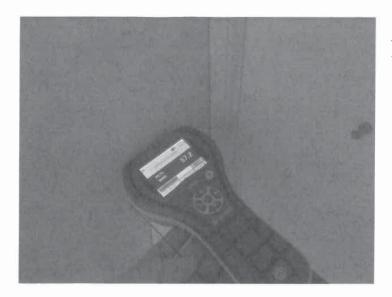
Elevated moisture level about a foot from the base of the wall under the window outside of the women's restroom
